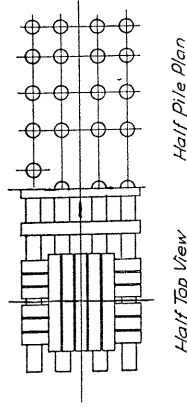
Recommended Practice for Creosoted Timber Pile Piers for Long Spans, E-60 Loading. Pier for 150-ft. and 80-ft. Spans.
